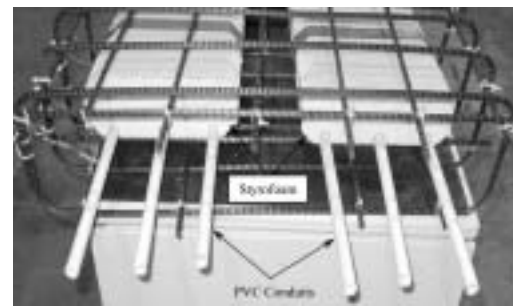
Details of longitudinal section of box-beam Bridge Model BBD-I.
